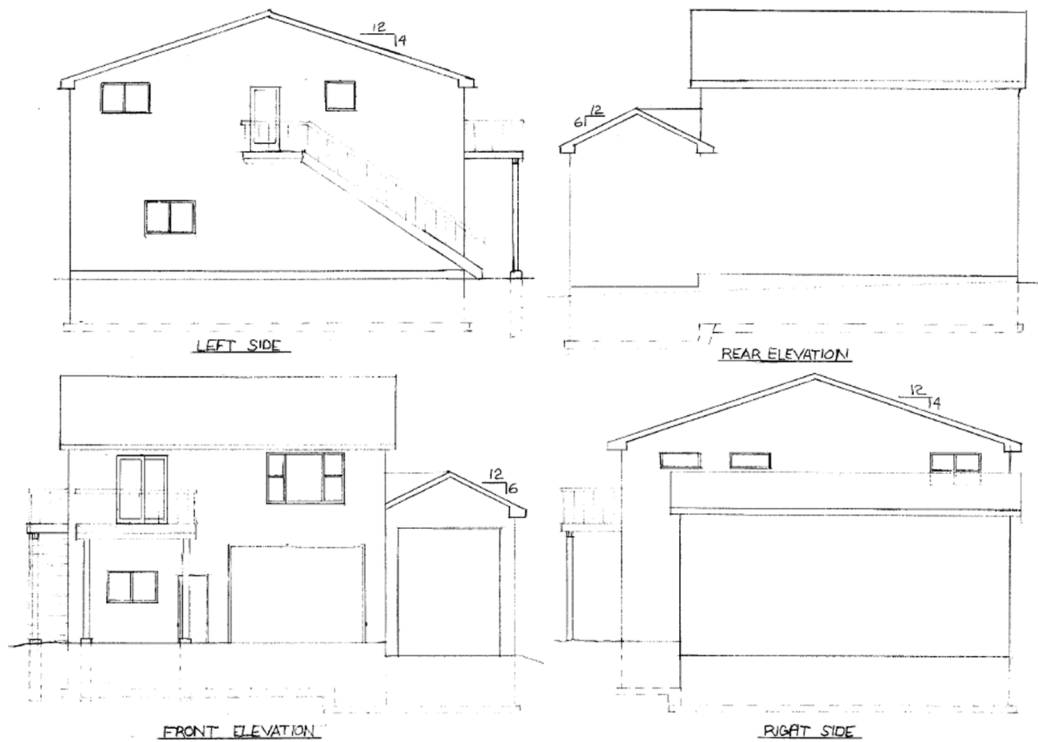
Proposed Elevation Plans of the proposed detached garage/ARDU
